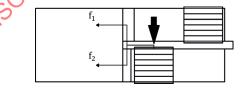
Flights of stairs isolated from building landing and floor (vertical section)
